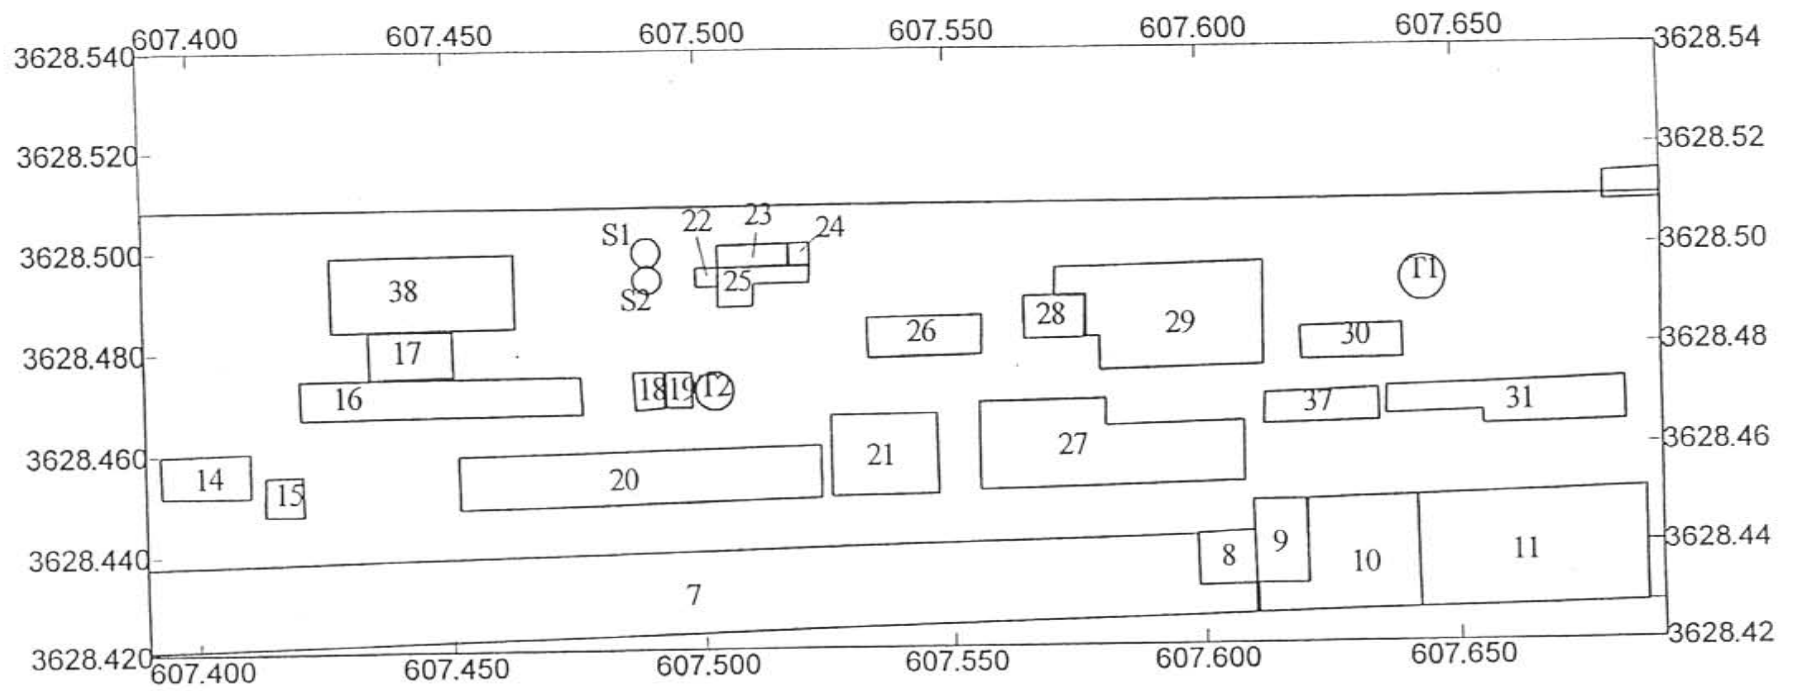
B. LOCATION OF BUILDINGS AT THE SOUTHWEST PLANT (CONTINUED).
